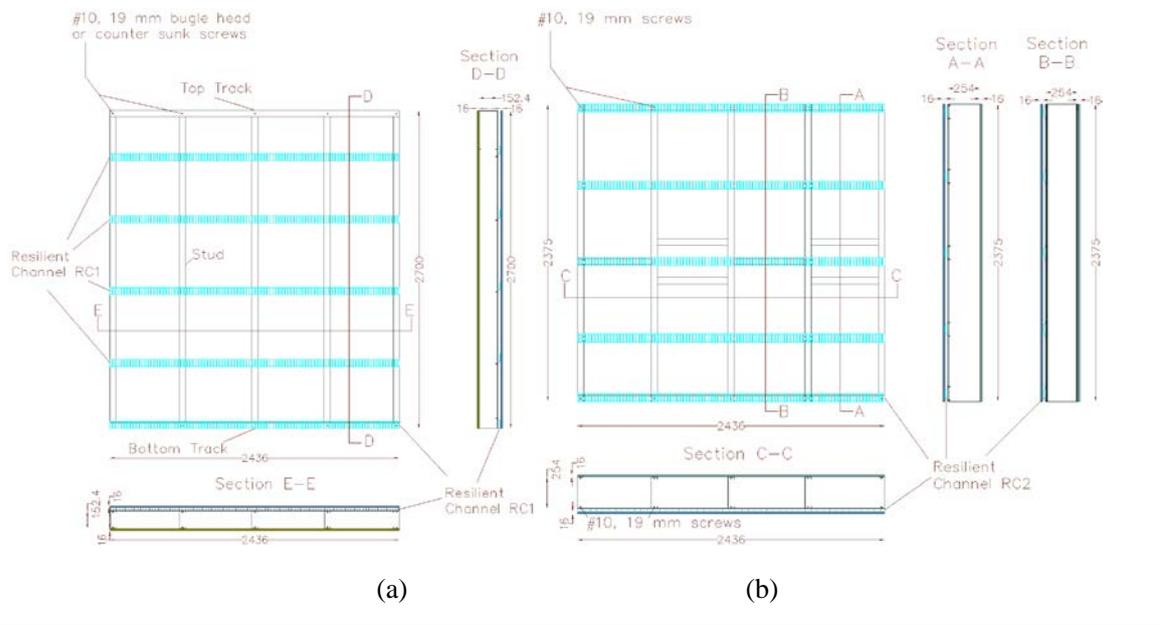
Framing for test specimen CFS01 (a) Wall (b) Diaphragm
